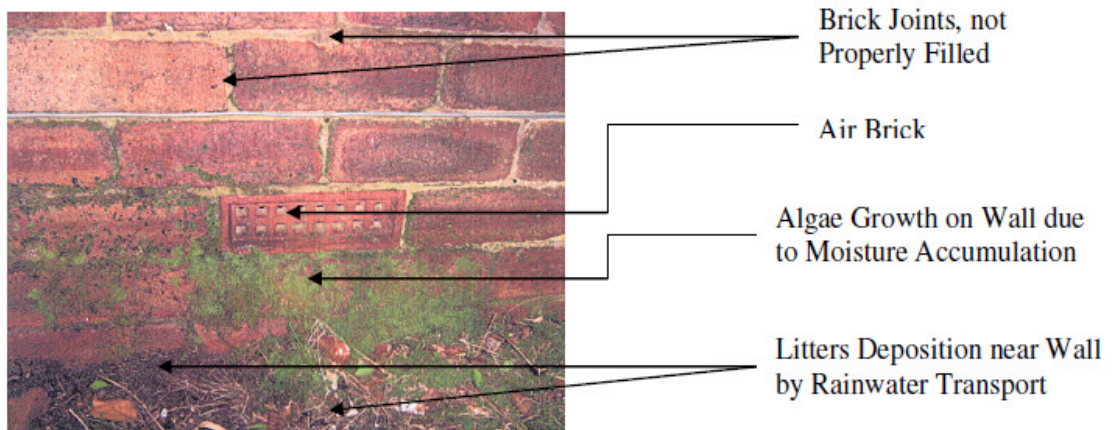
Use of air brick for wall cavity ventilation [50]
